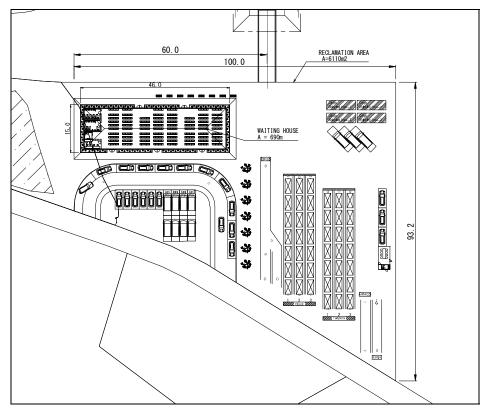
Terminal Layout Plan of the Djibouti Port
